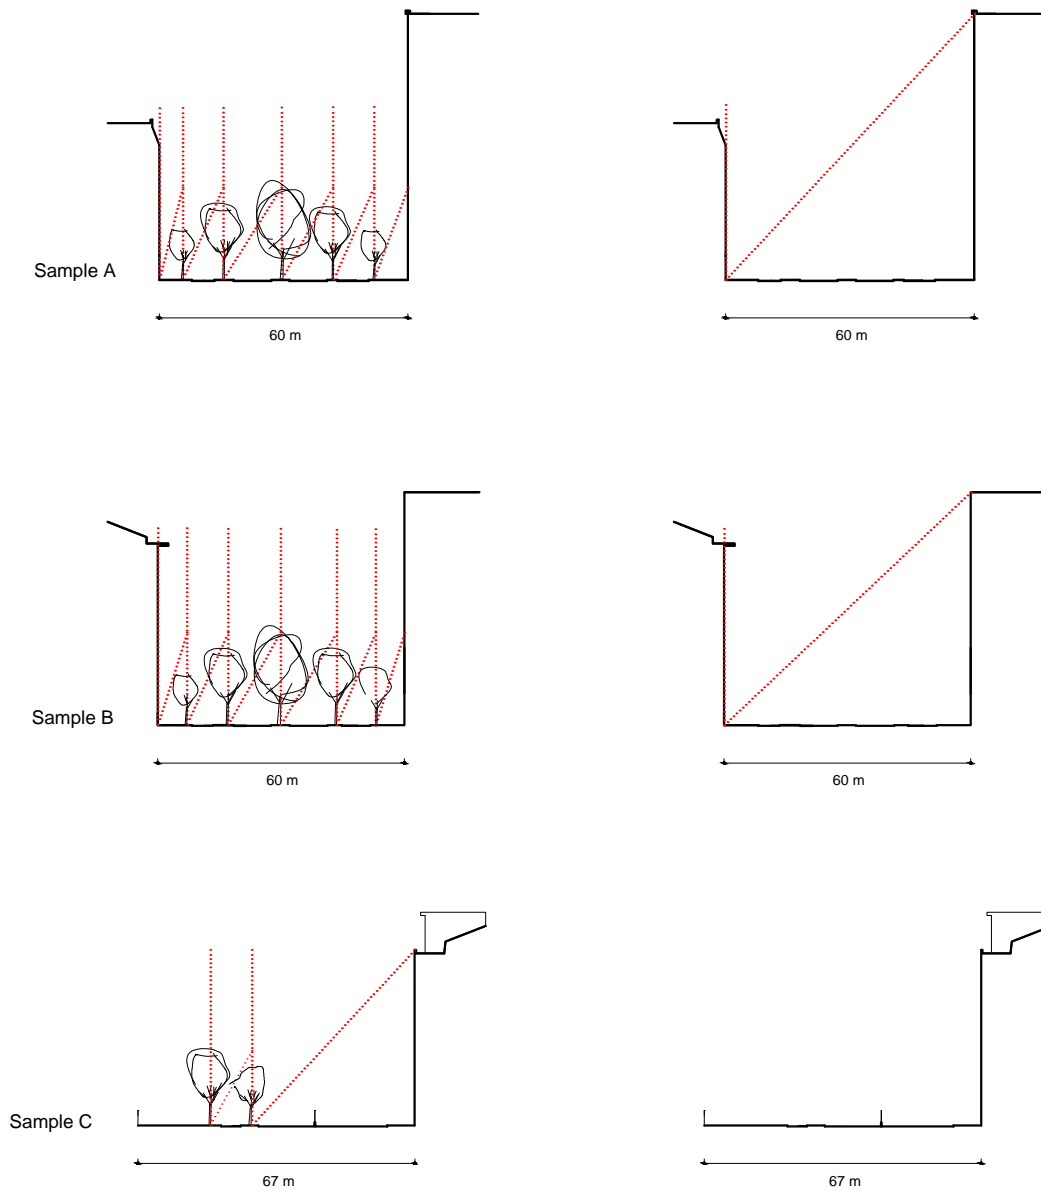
Cross-sections of the three selected samples in Avenida da República show the street width and building height ratios. (Source: Author's Edition).
